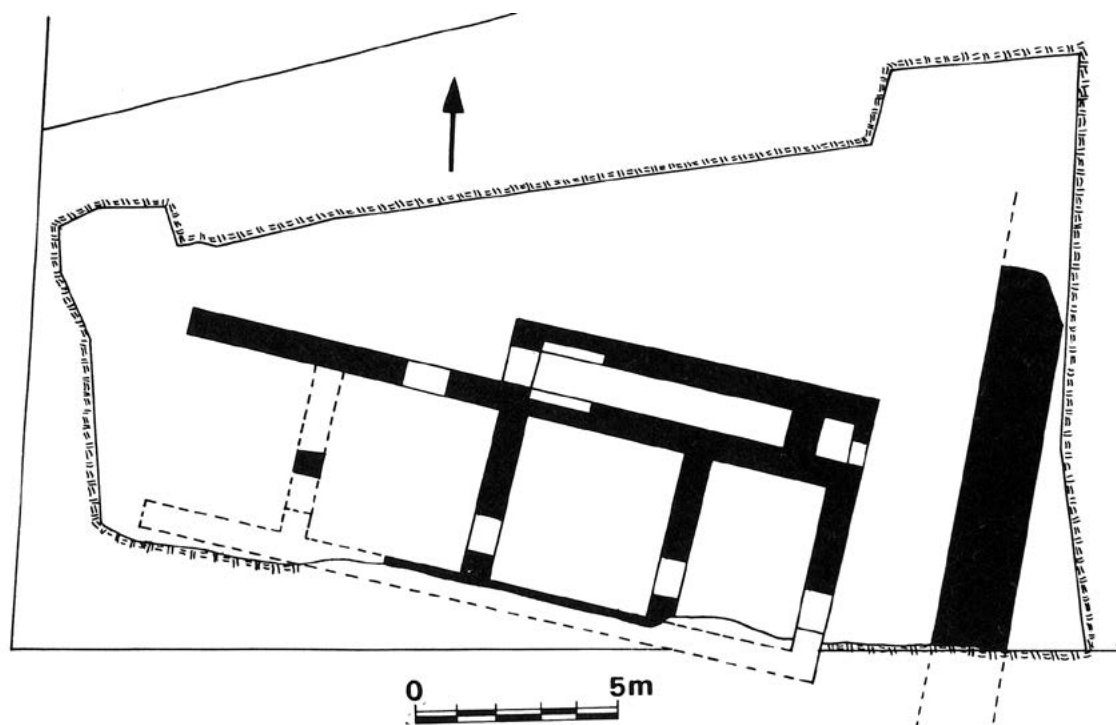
PLAN OF THE FORTIFIED BUILDING AT THEBES (AFTER ARAVANTINOS 1986: 58 FIG. 53).
